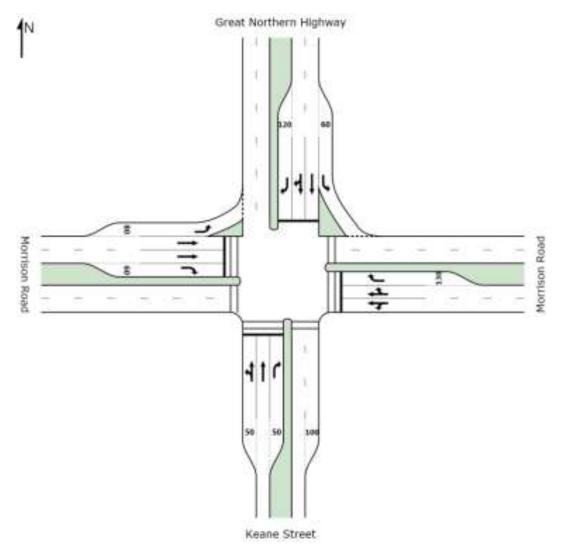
Proposed Intersection of Morrison Road and Keane Street
